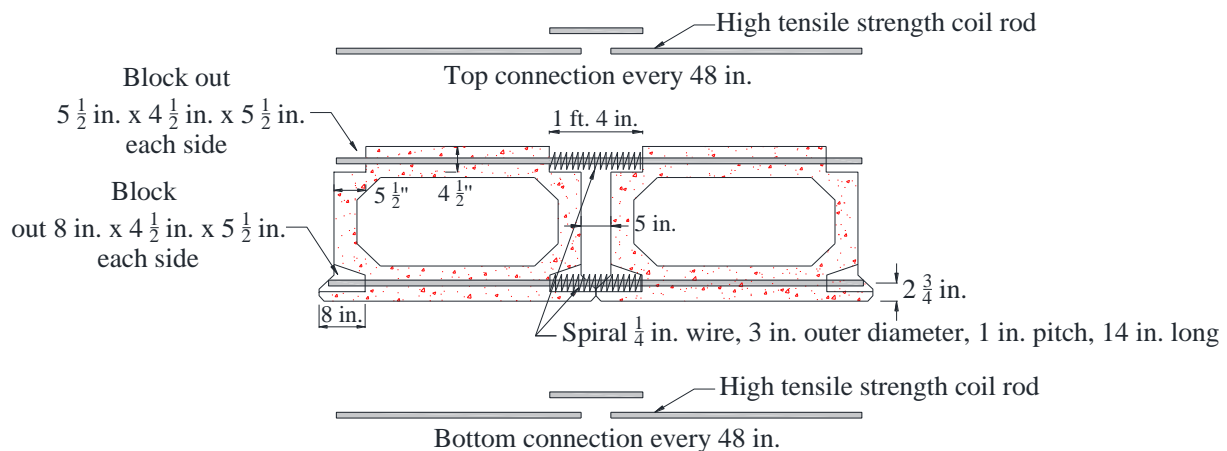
Wide joint transverse connection detail (Reproduced from Hanna et al. 2011)
